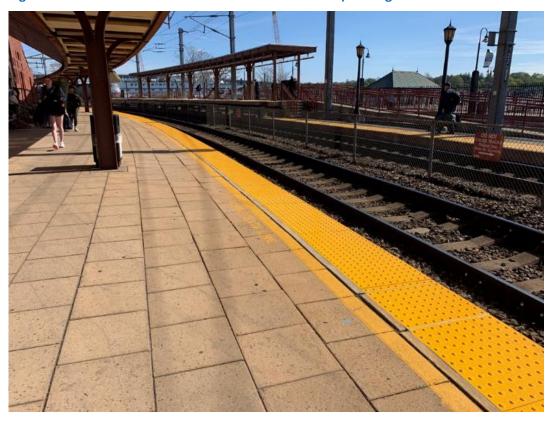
MP 122.90 - Platforms - New London Station (Looking Southwest) from S. Water Street Crossing
